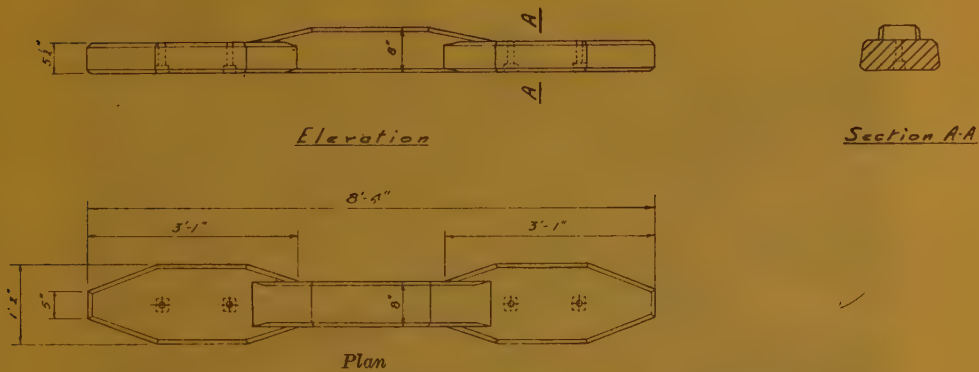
Experimental reinforced concrete sleeper. British Railways.
